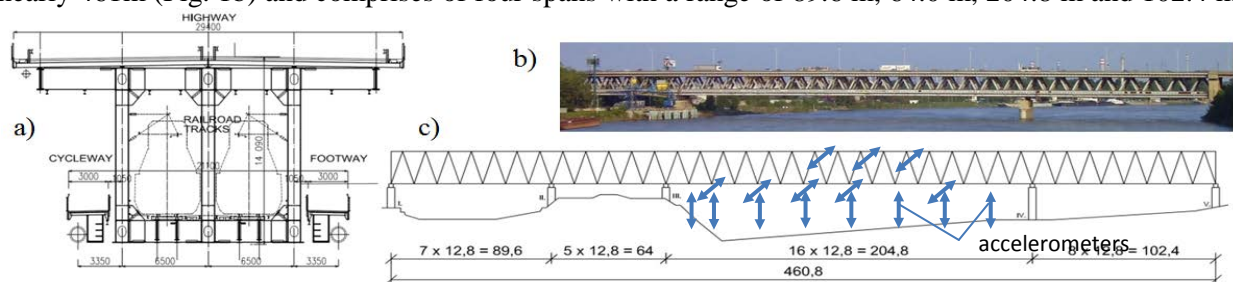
The Port Bridge - a) cross-section, b) north view, c) side drawing (in m) with accelerometers.
